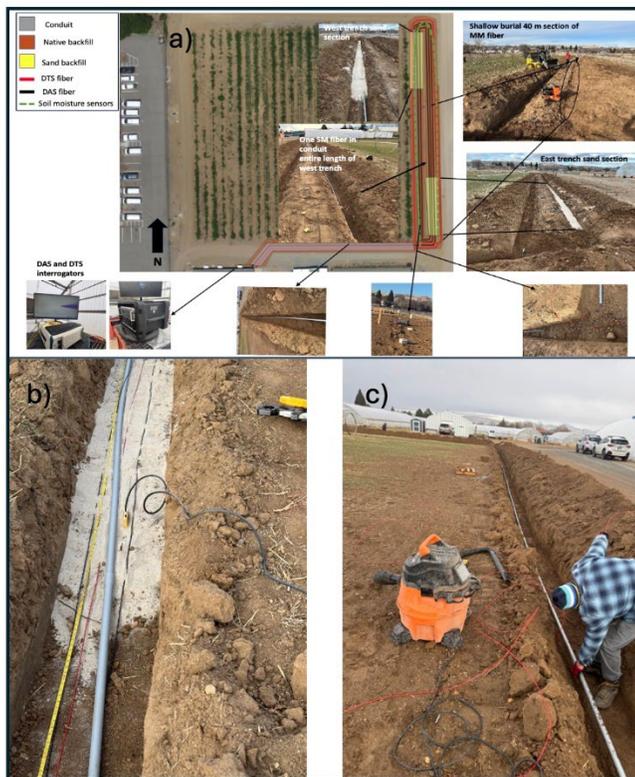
UNR Farm Fiber Optic Test Bed used for CTEMPs training. (a) Overview of the test site showing conduit, sand-backfilled, and native-soil fiber installations. (b) Trench installation examples illustrating different coupling conditions used to evaluate DAS and DTS responses. (c) Field deployment at UNR Farm Fiber Optic Test Bed. Photo credits: (b-c) S. Sayyadi.
